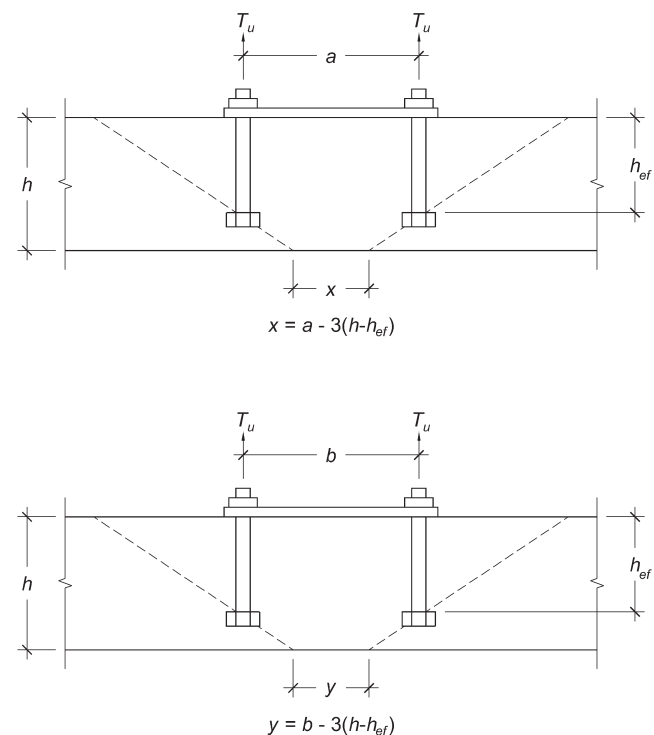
Breakout cone for group anchors in thin slab.
